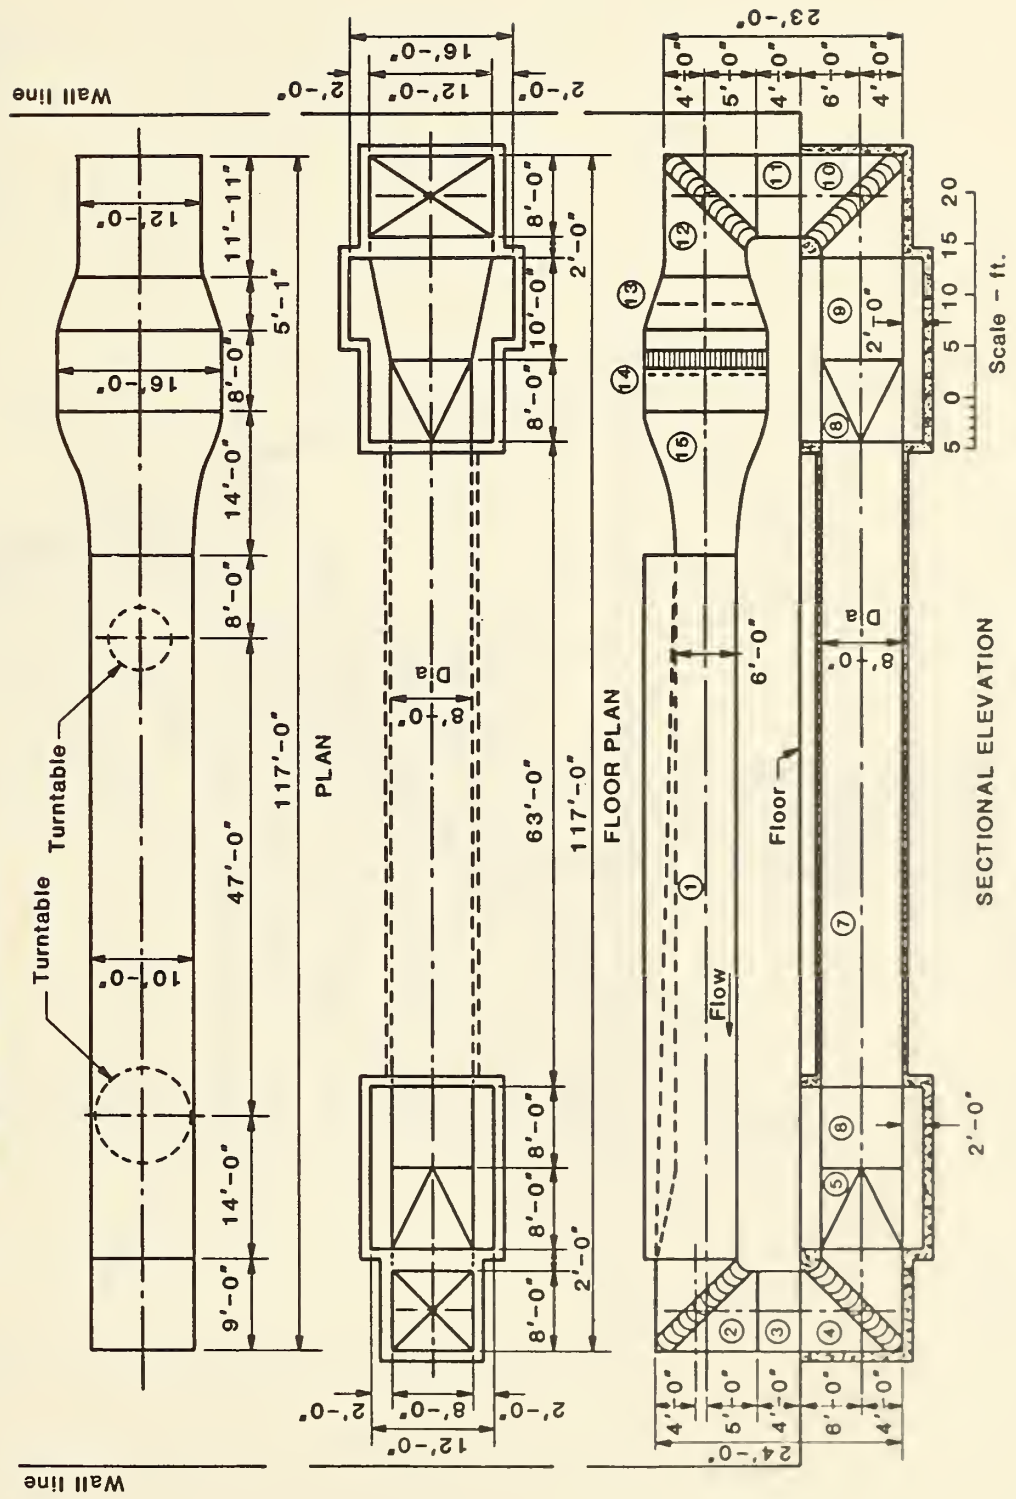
Closed-Circuit Tunnel. Plan and Sectional Elevation
